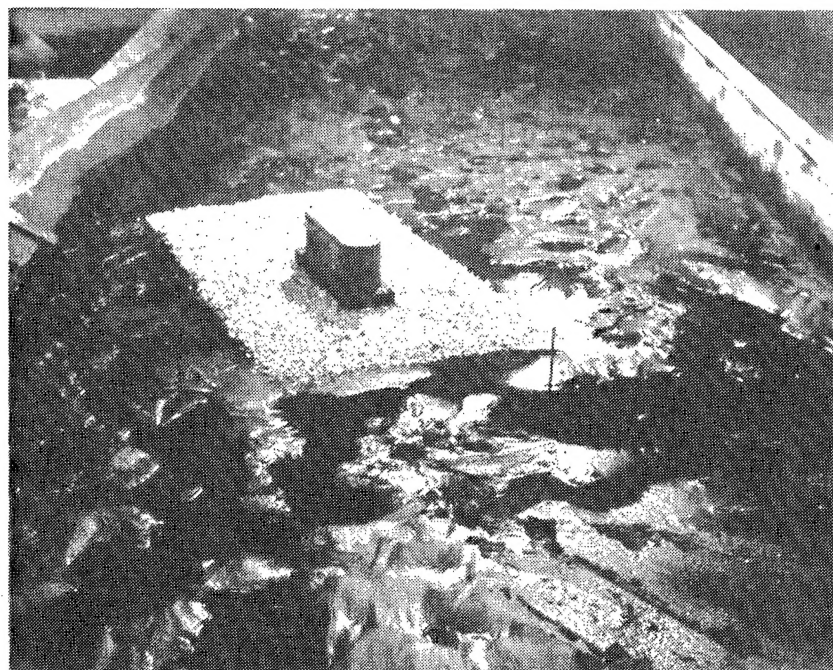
Run 12 looking downstream showing stone blanket flush with bed (elevation 1.2) before run was started.
